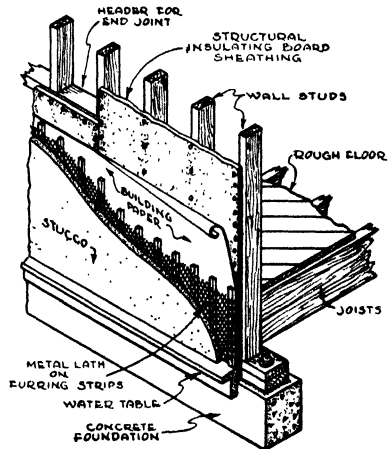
Structural Insulating Board Used as Sheathing under Stucco
